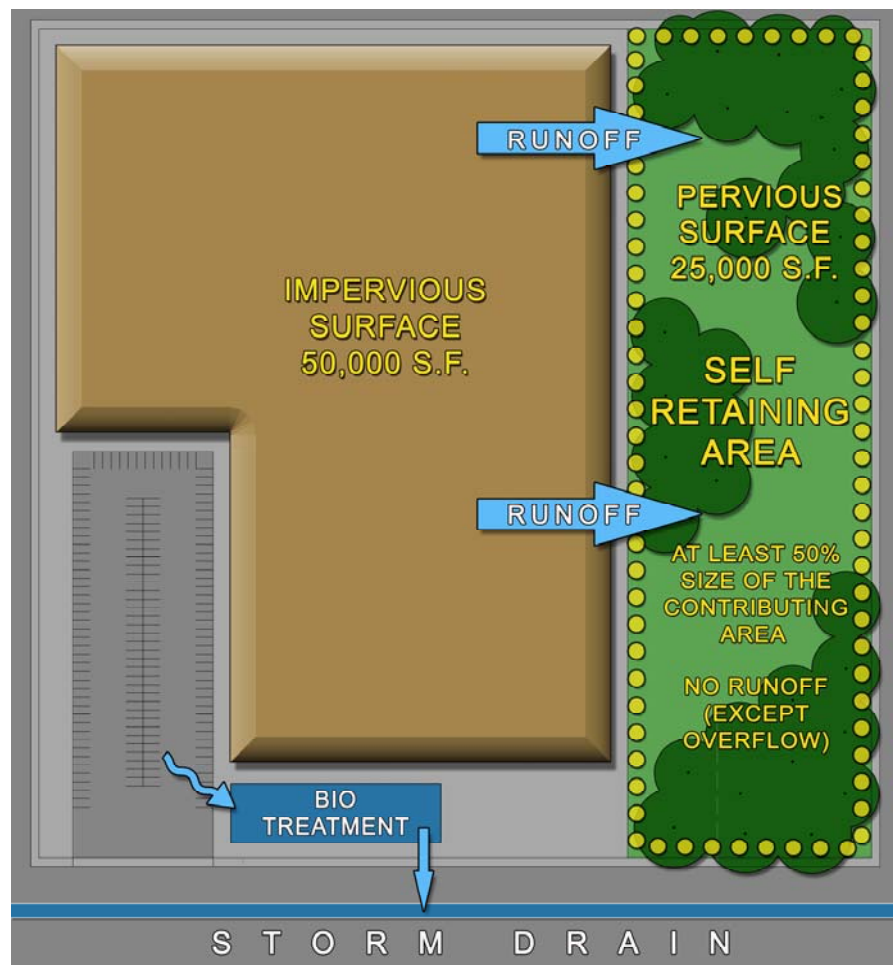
Schematic Drainage Plan for Site with a Self-Retaining Area
